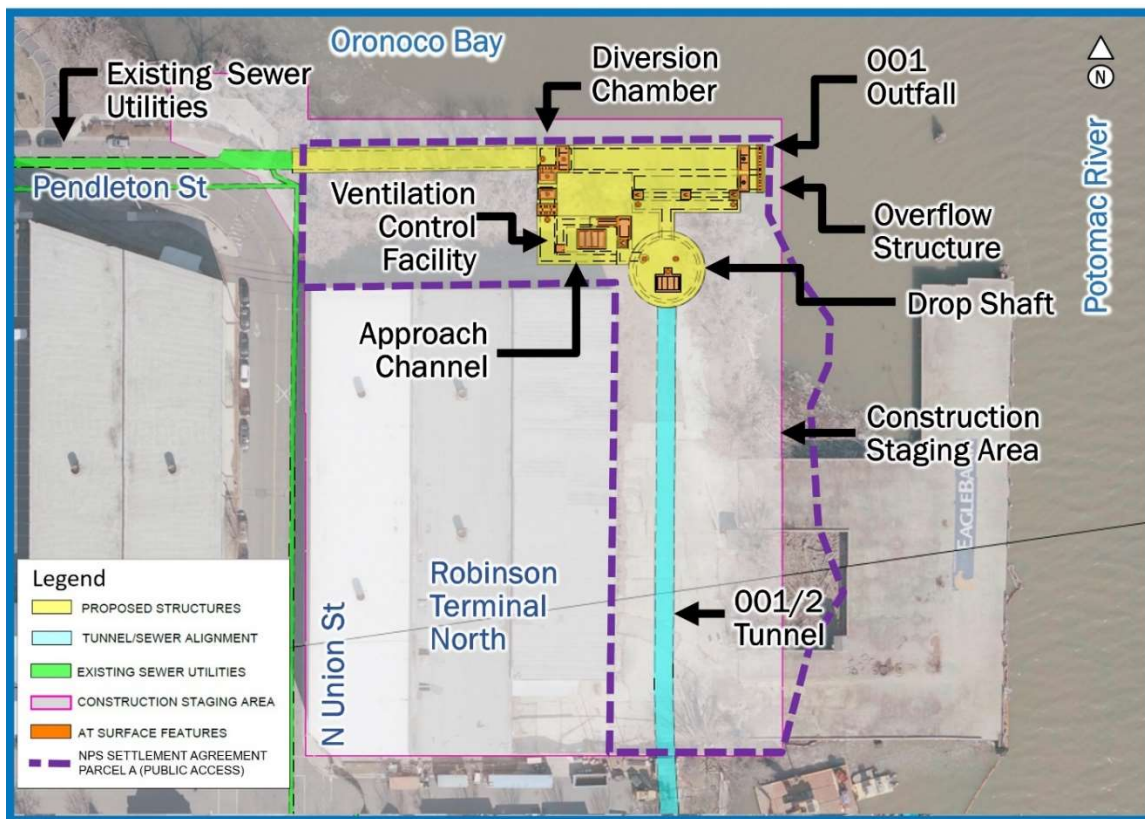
Robinson Terminal North Diversion Facility (pairs with Potomac River and Union Street Alignments)
